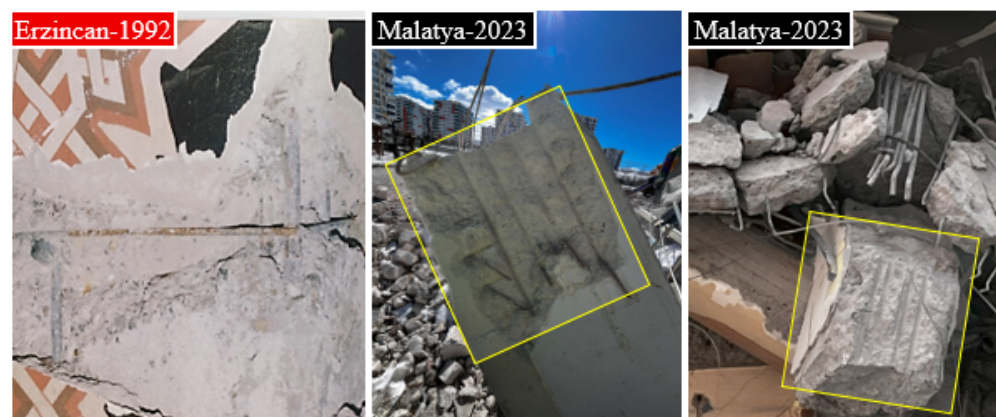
Examples of bond deterioration and pullout-related damage of longitudinal reinforcement observed in reinforced concrete members after the Erzincan and Malatya earthquakes. The yellow boxes indicate regions of bond degradation and reinforcement pull-out failure.
